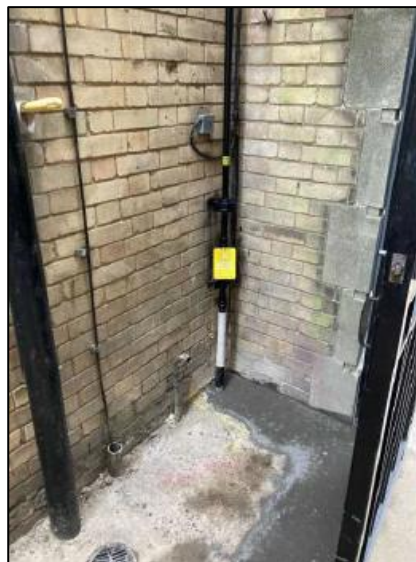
Extent of new gas pipe installations on the south west facing elevation of 35 Belsize Park.
